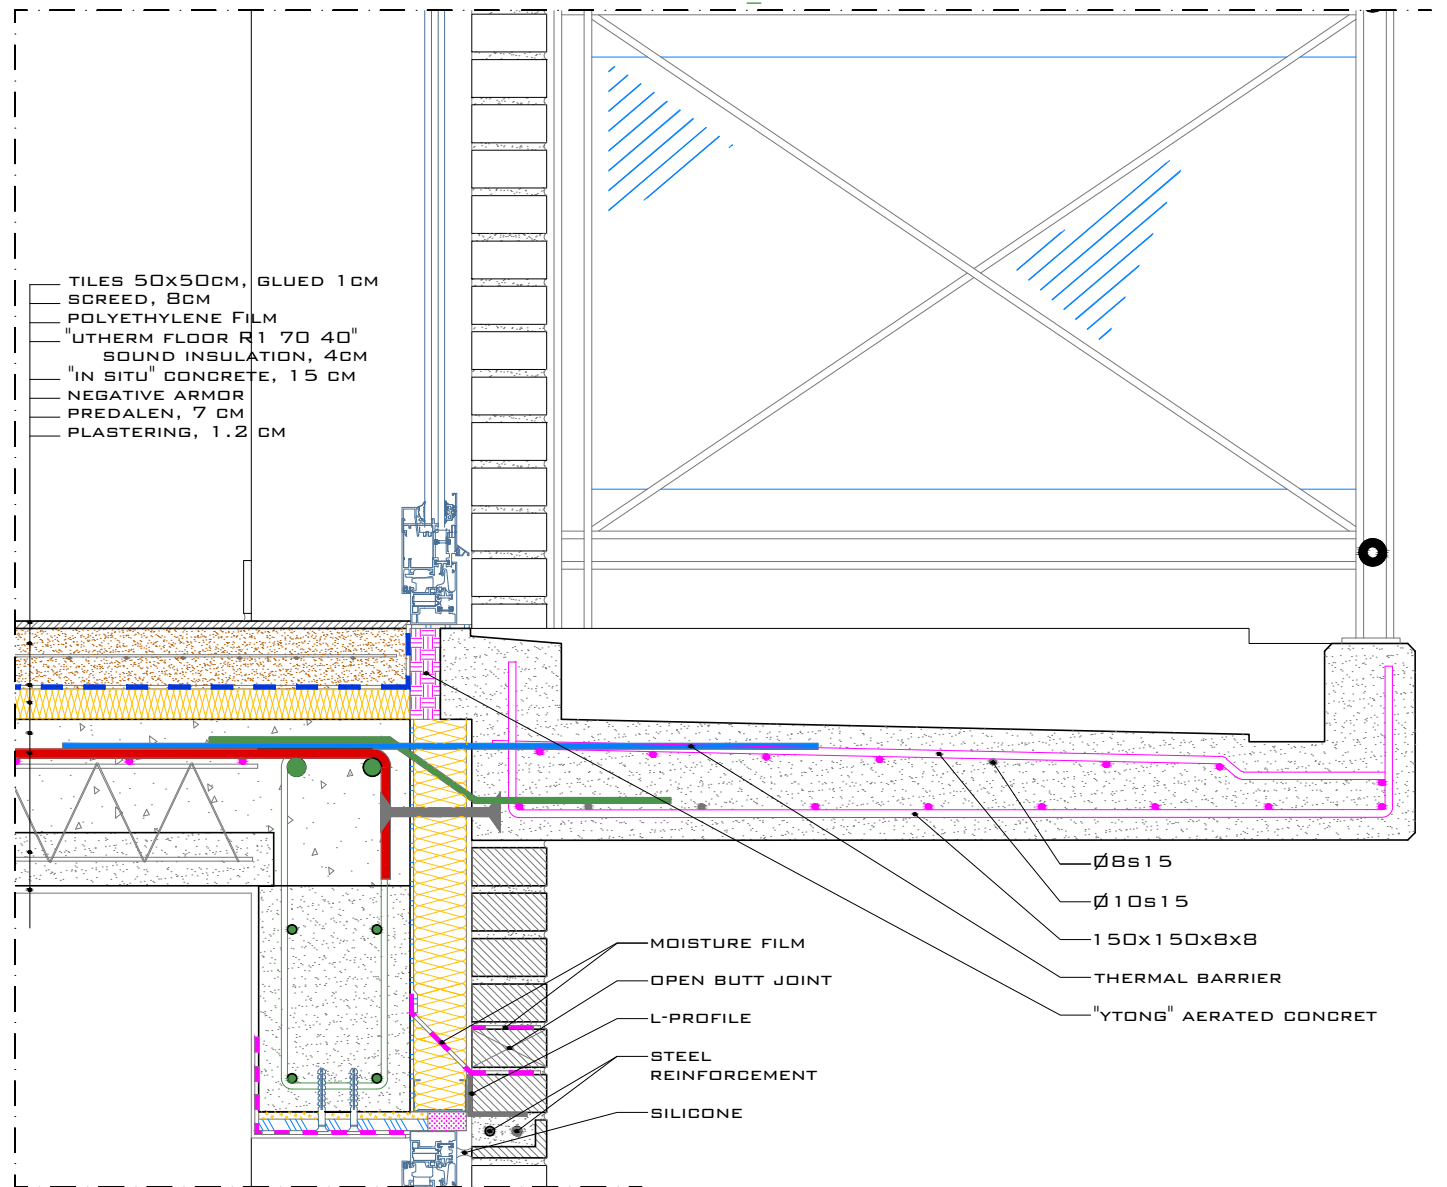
UNION TERRACE-RESTAURANT\_FACADE\_S: 1/10
